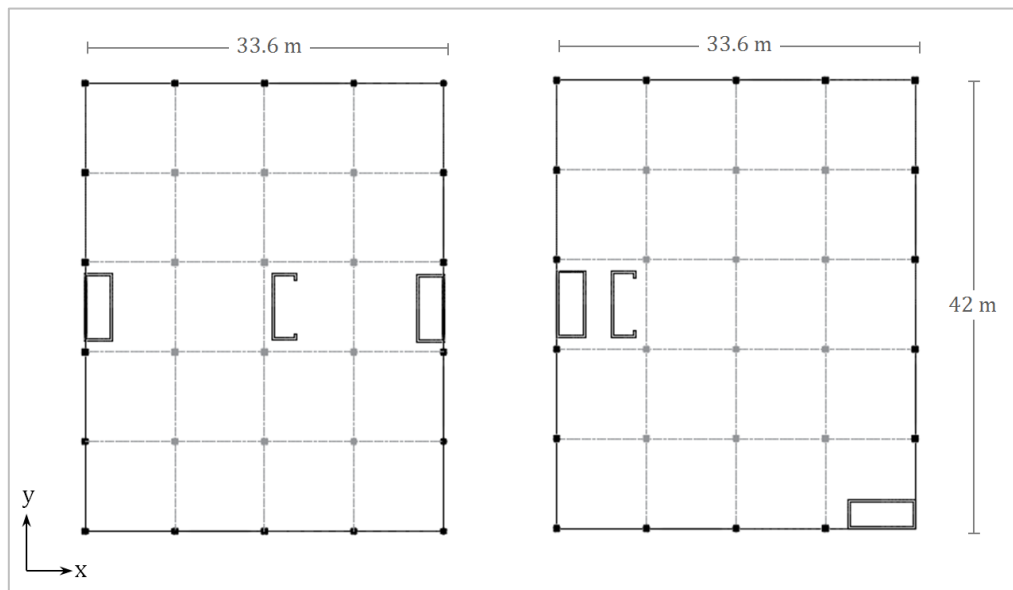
5-storey building plans with plan symmetry and asymmetry
